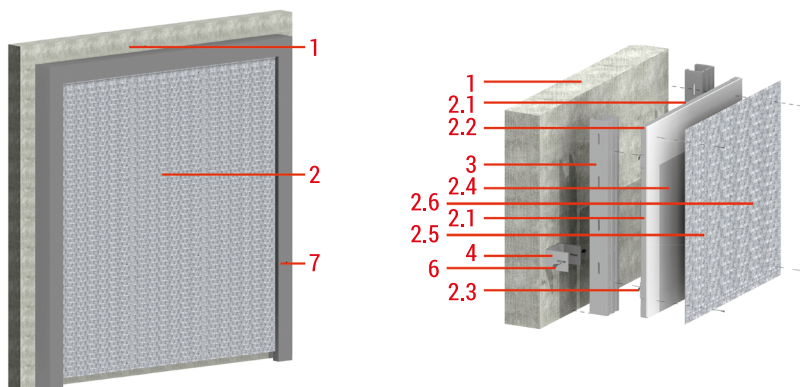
Axonometry and detail of the basic module. Legend: 1. Load bearing layer; 2. Modular panel; 2.1 Bi-directional aluminium frame, box profiles 60 x 30 mm, 4 mm thick; 2.2. Corner joint; 2.3. Plate with gravity anchorage hook; 2.4. PVC stiffening panel; 2.5. Four layers of felt for water drainage, root growth and plant containment; 2.6. Plants; 3. Aluminium mullion, C-section 125 x 100 mm, 8 mm thick; 4. Aluminium anchoring bracket; 5. Mechanical anchor for anchoring to the load bearing layer; 6. Screws for fixing upright to bracket system; 7. Aluminium profile for perimeter containment (Source: own elaboration)
